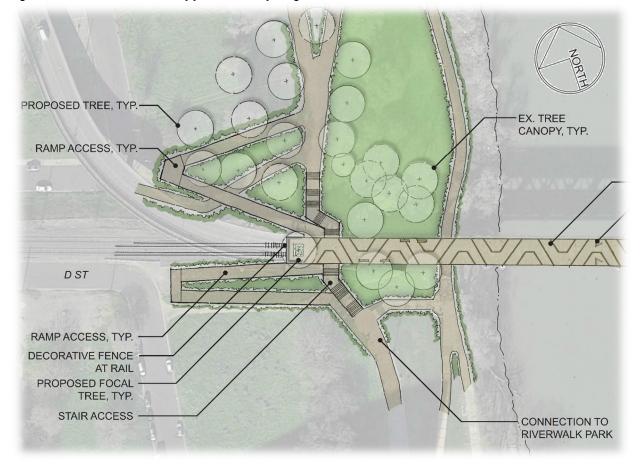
West Sacramento Approach Ramp Alignment Alternative 1
